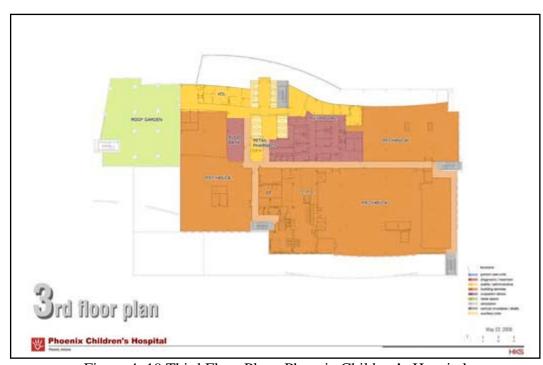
19 Third Floor Plan, Phoenix Children's Hospital
